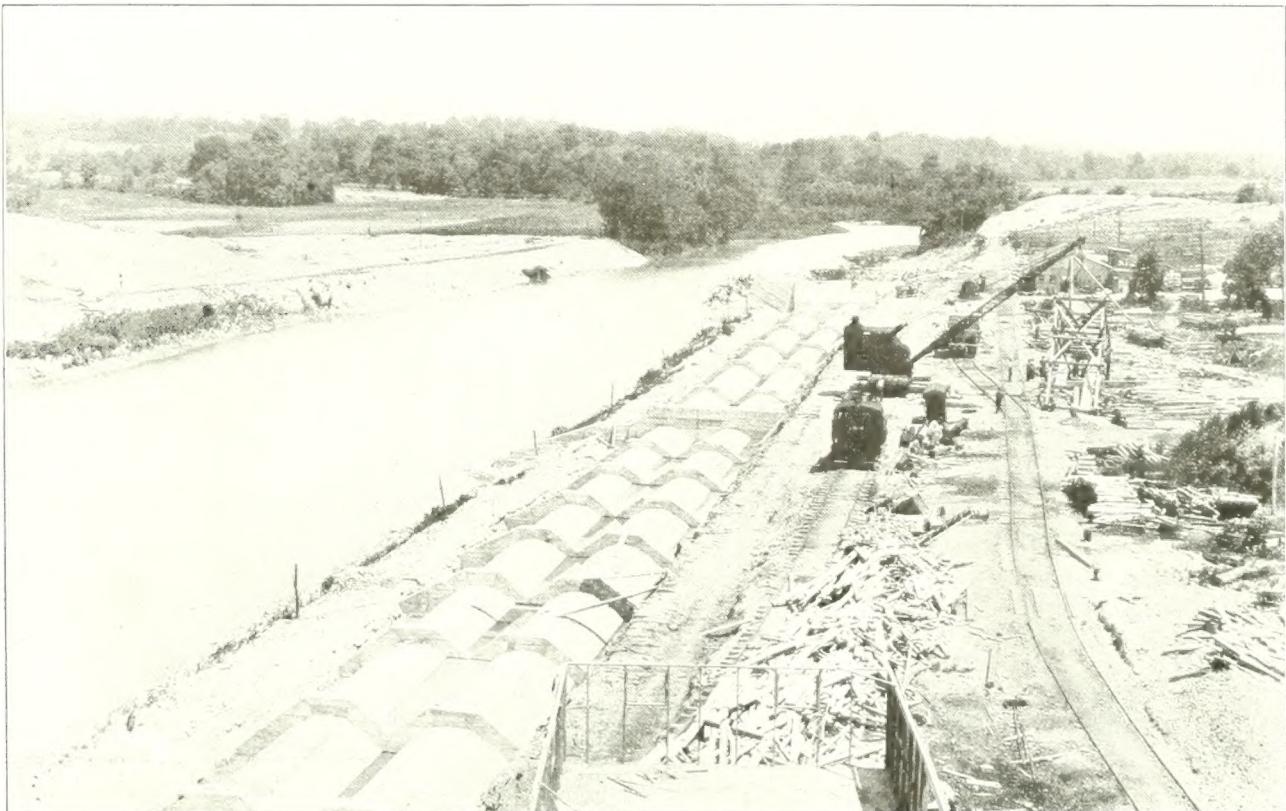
CONCRETE OUTLET CONDUITS, ENGLEWOOD DAM, LOOKING DOWNSTREAM, JUNE 28, 1919
